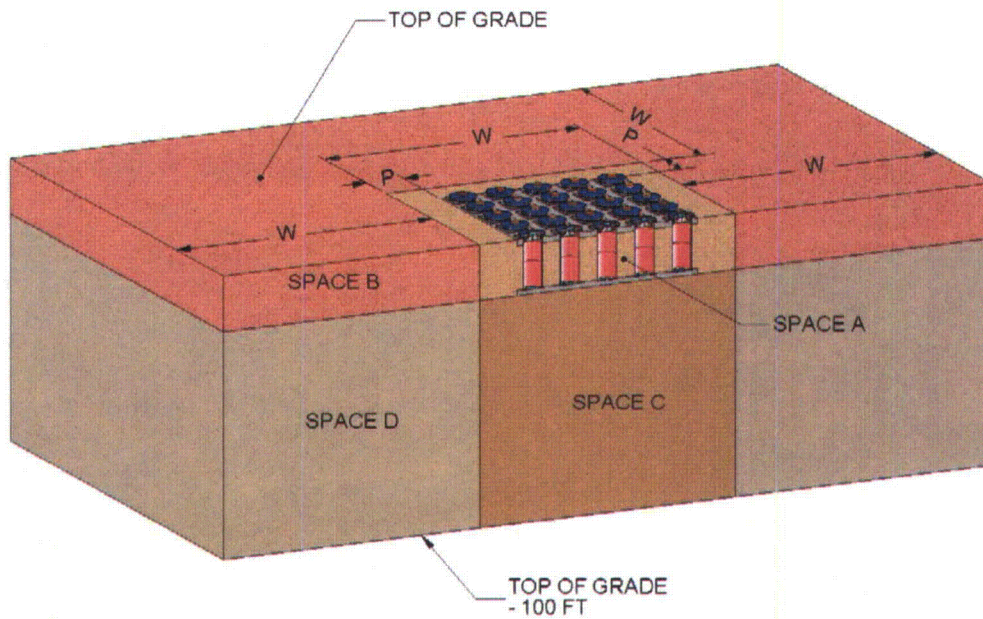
SUBGRADE AND UNDERGRADE SPACE NOMENCLATURE
